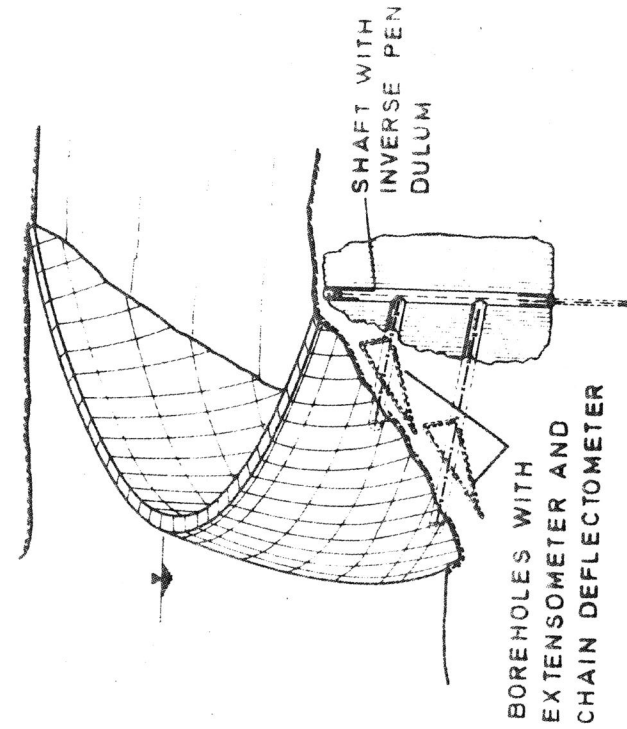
MEASUREMENT SYSTEM IN AN ABUTMENT OF A DAM
